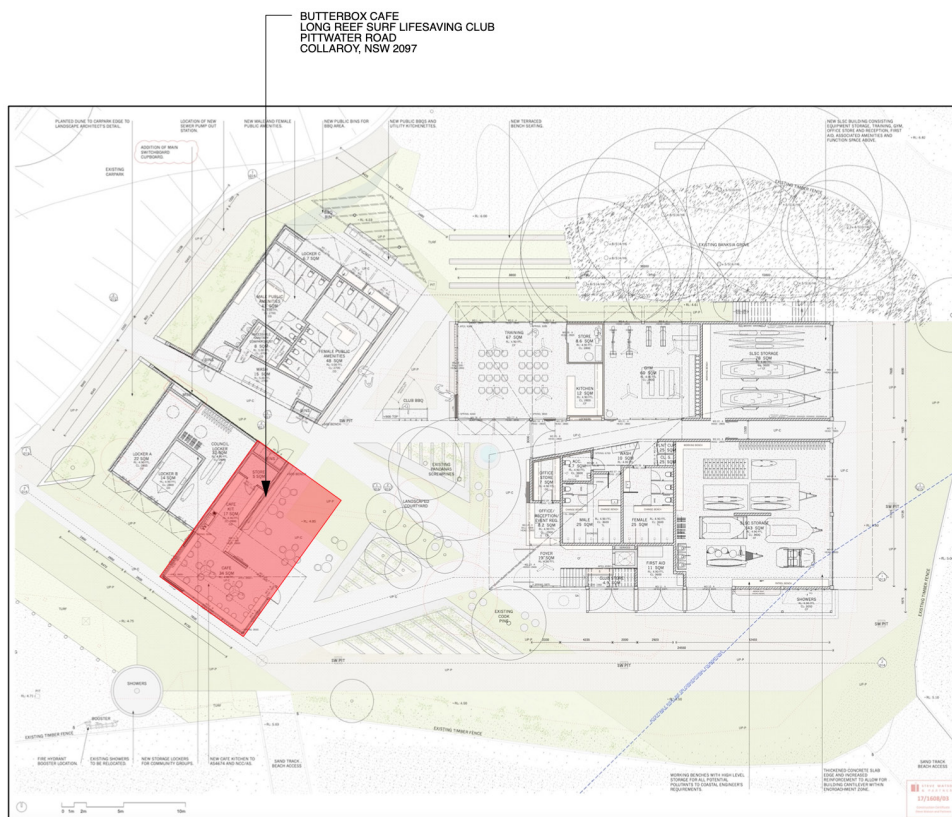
Site Plan showing subject cafe tenancy including outdoor dining area shaded in red.
